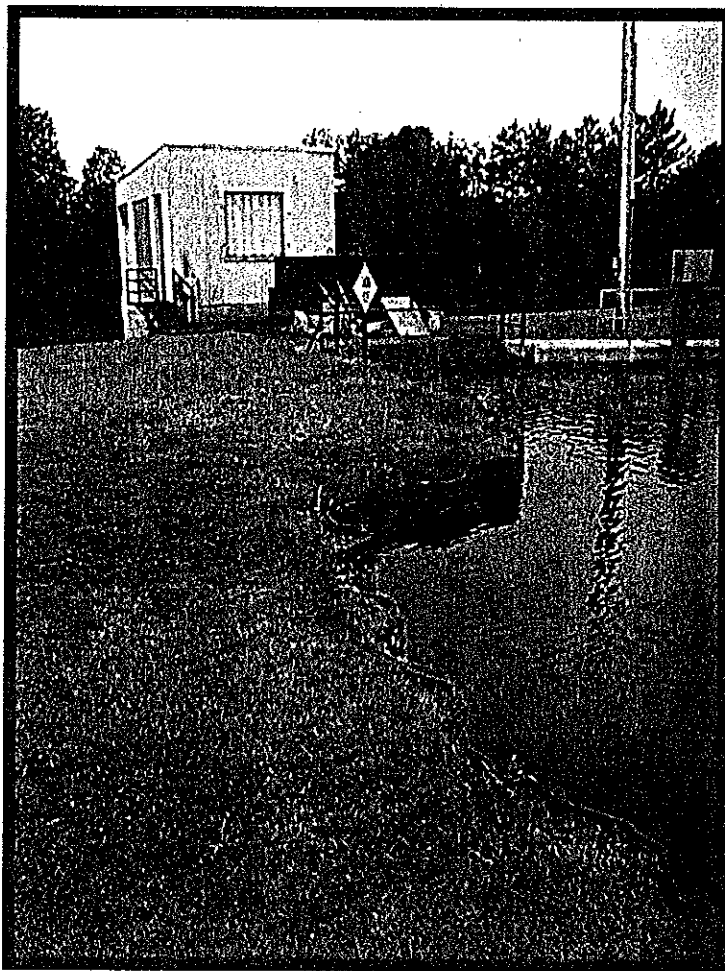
Leak through spillway surface, minor cracking in right retaining wall.
